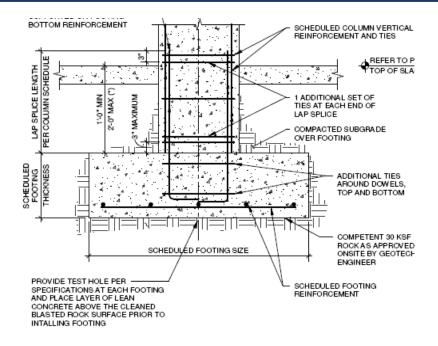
| Typical Foundation Detail (Courtesy of Walter P. Moore)
